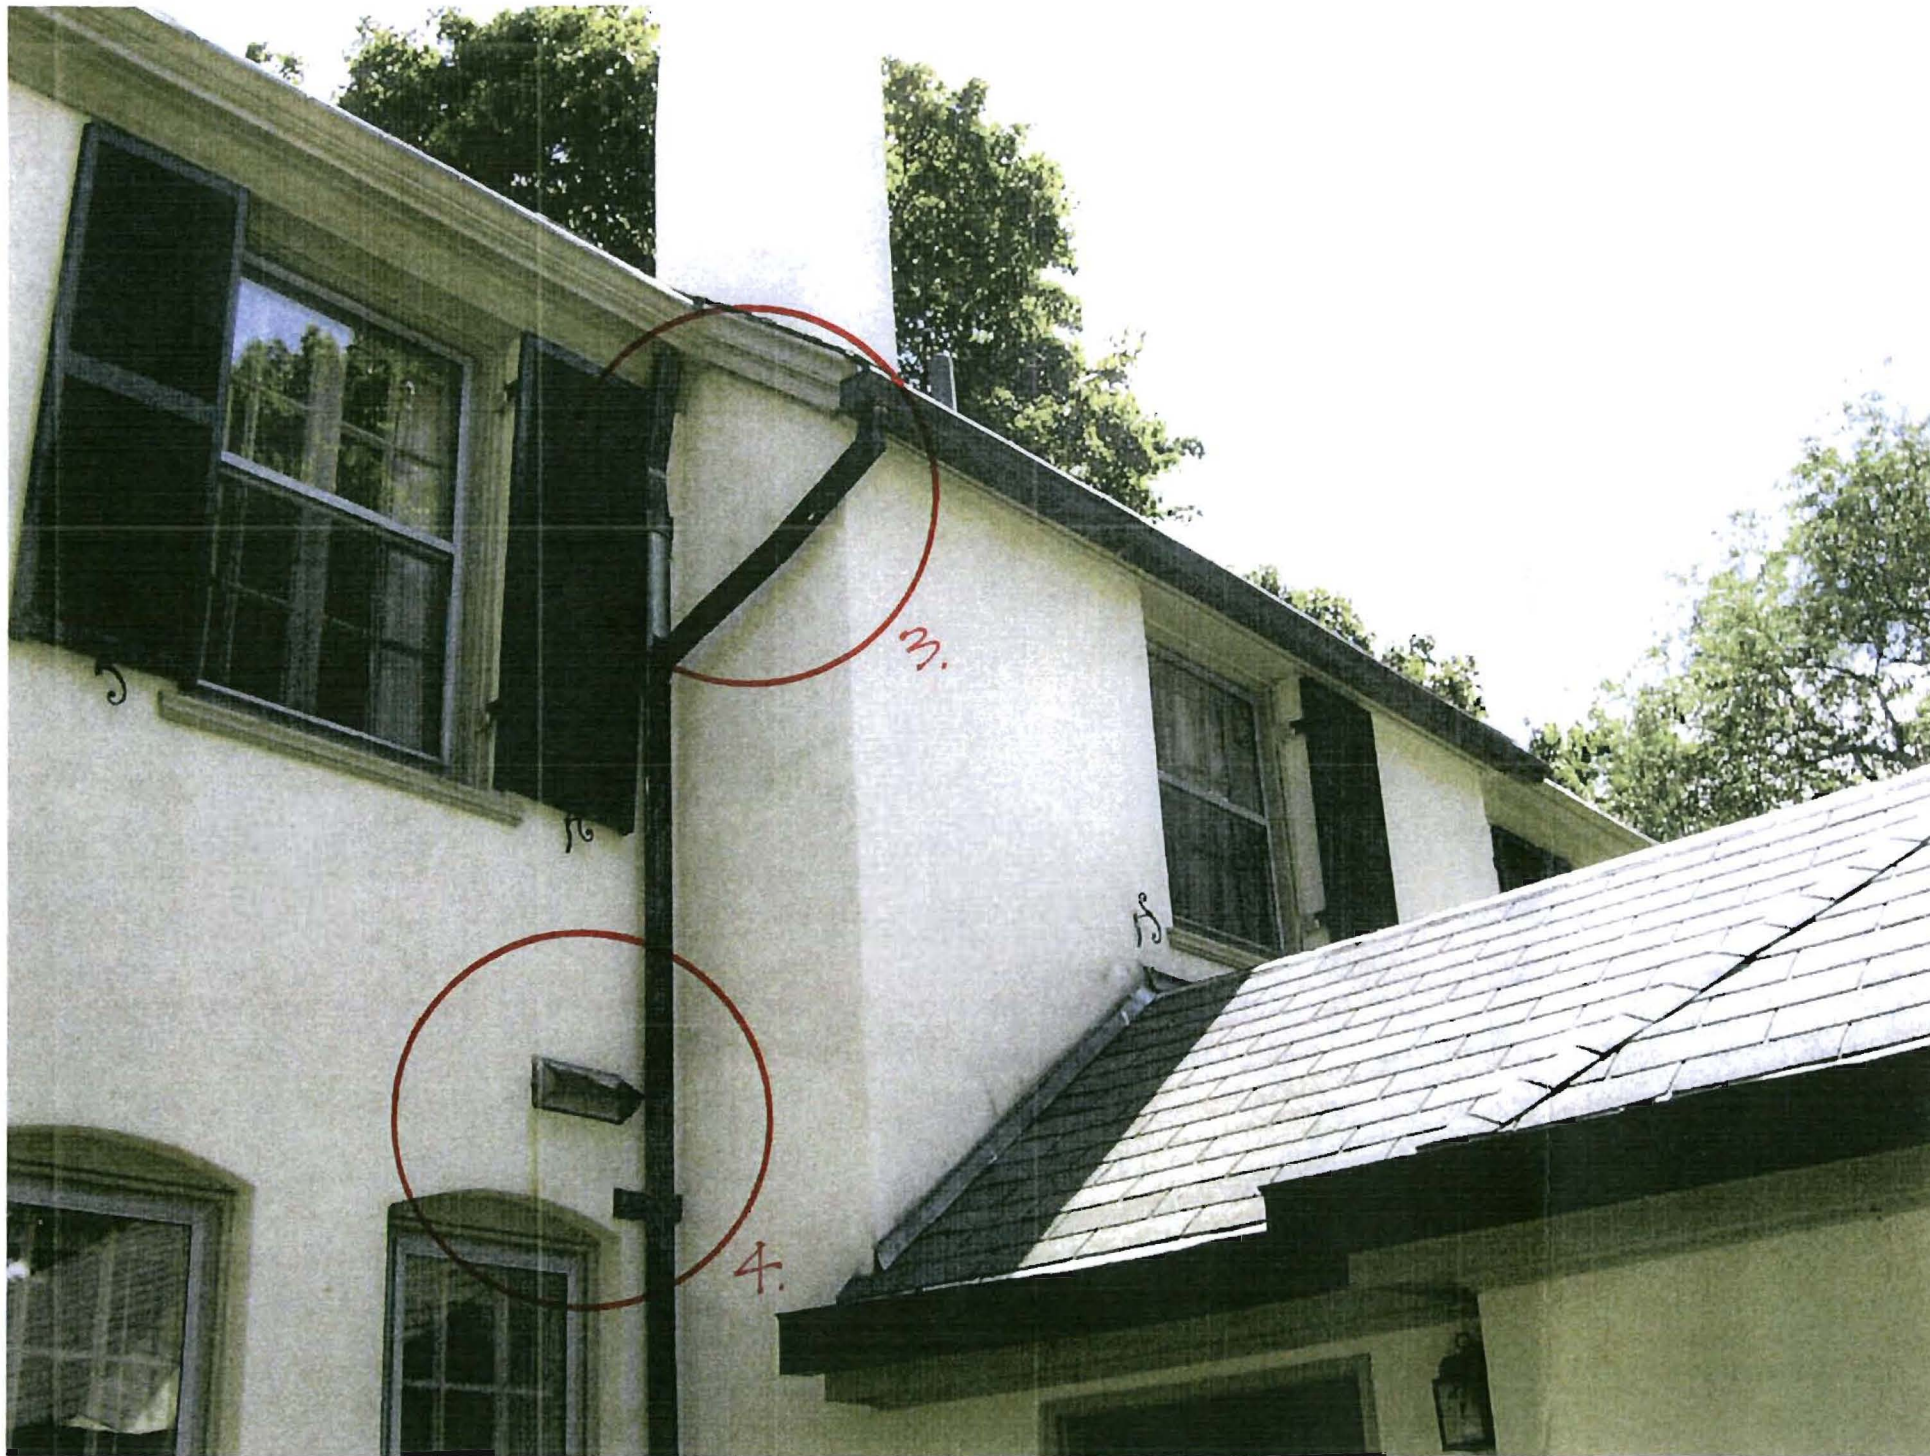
PHOTO VIEW OF EXISTING REAR (north) ELEVATION
